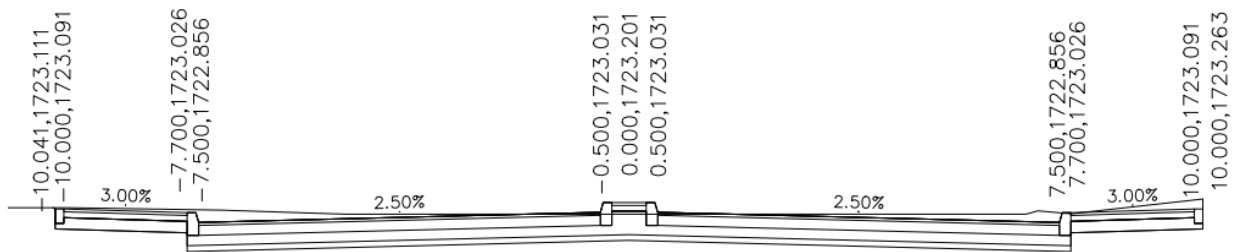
Cross Section for Arat Anbesa - Top View Café
